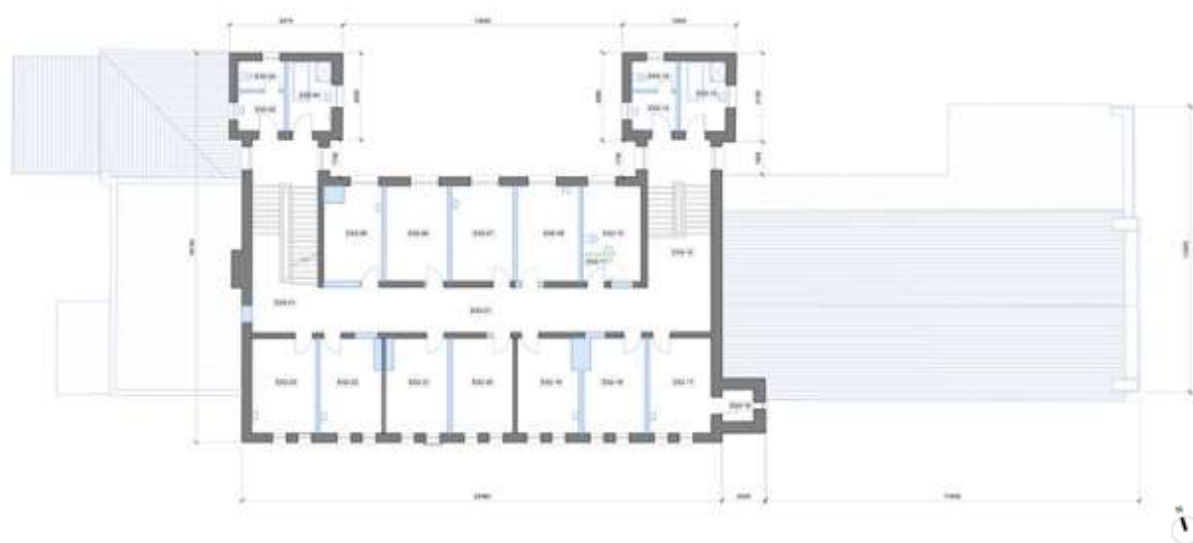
Second floor plan of convent building showing room numbers and showing proposed demolition in blue
